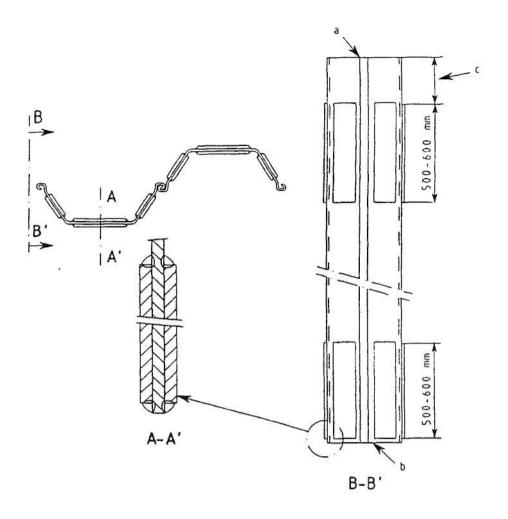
Example of strengthening using a chamfered partial sheet pile
